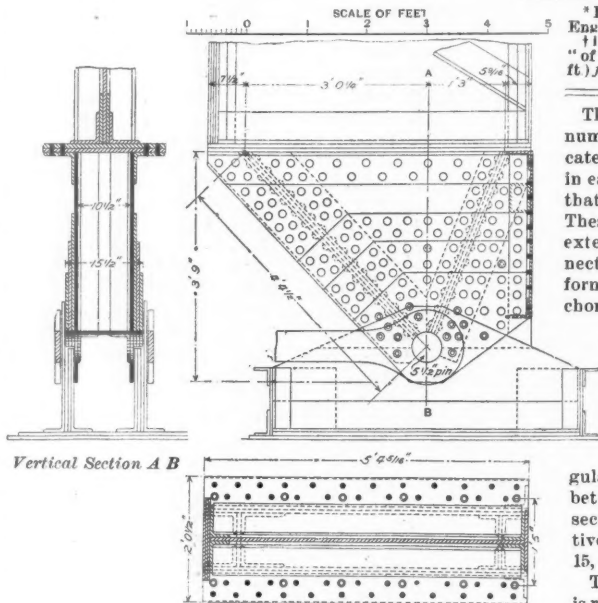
Foot Member of Truss Section; Elevation and Plan.
